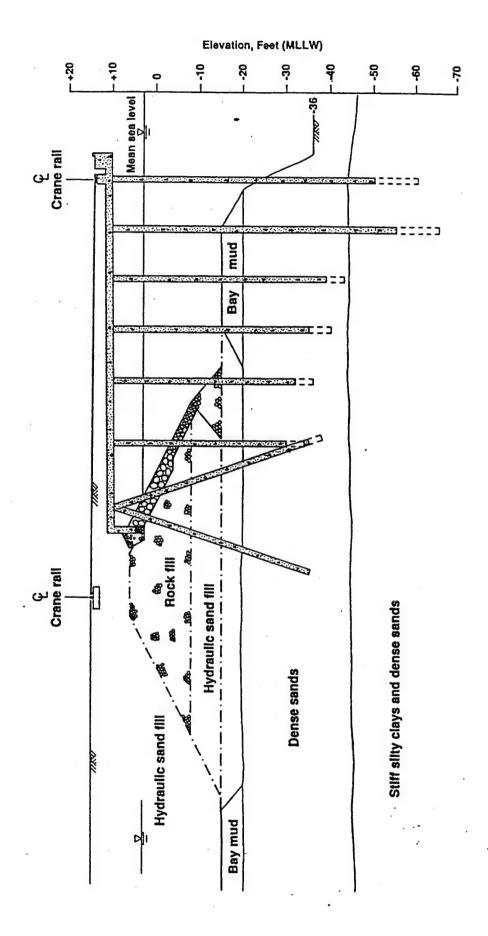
Cross-section 7th St Terminal, Port of Oakland.
